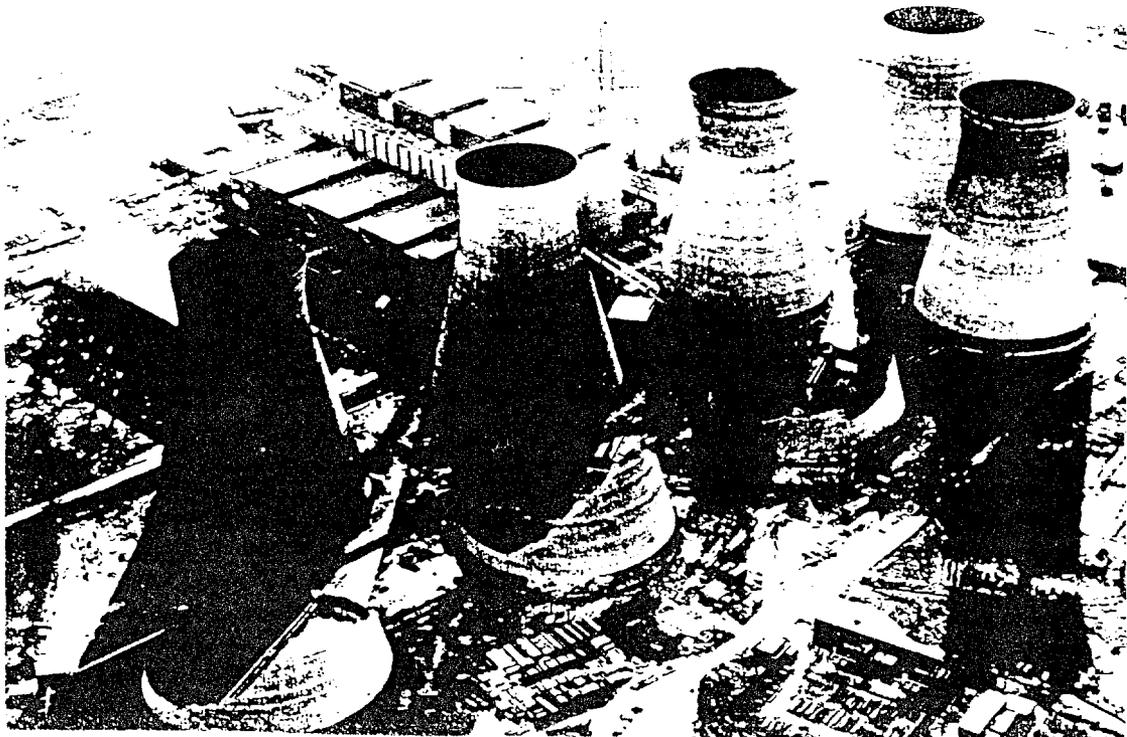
Cooling towers damaged by exceptional wind load.
